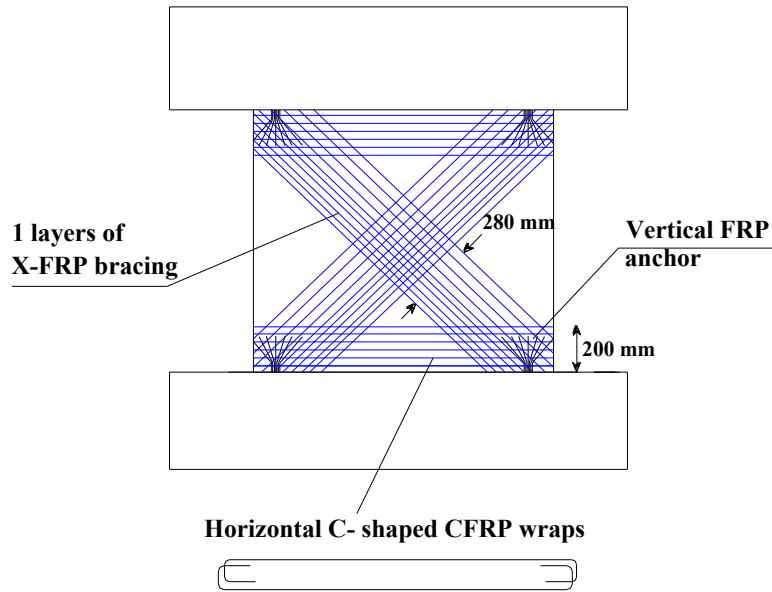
Schematic of the FRP retrofit scheme of wall panel RW2.
